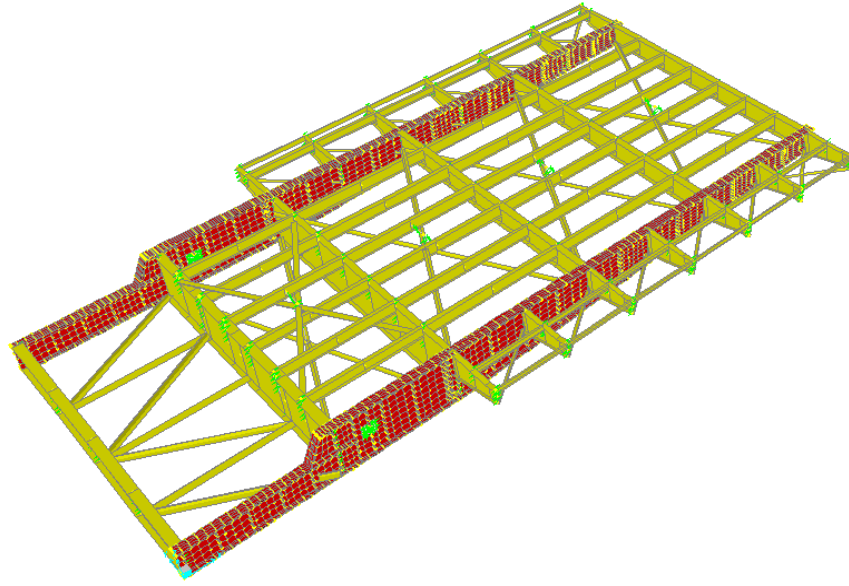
Main Girders, Floor Beams and Stringers of a Single Leaf
